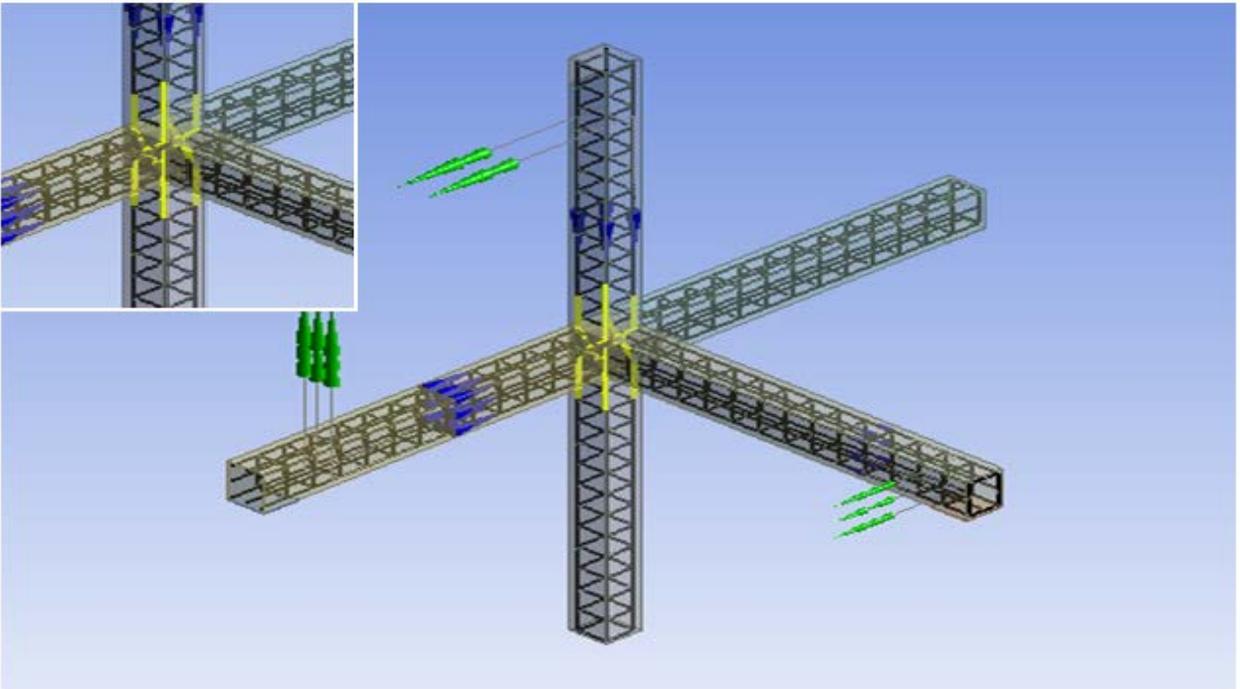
Modified reinforcement detailing of exterior joint with three beams (SS3)
